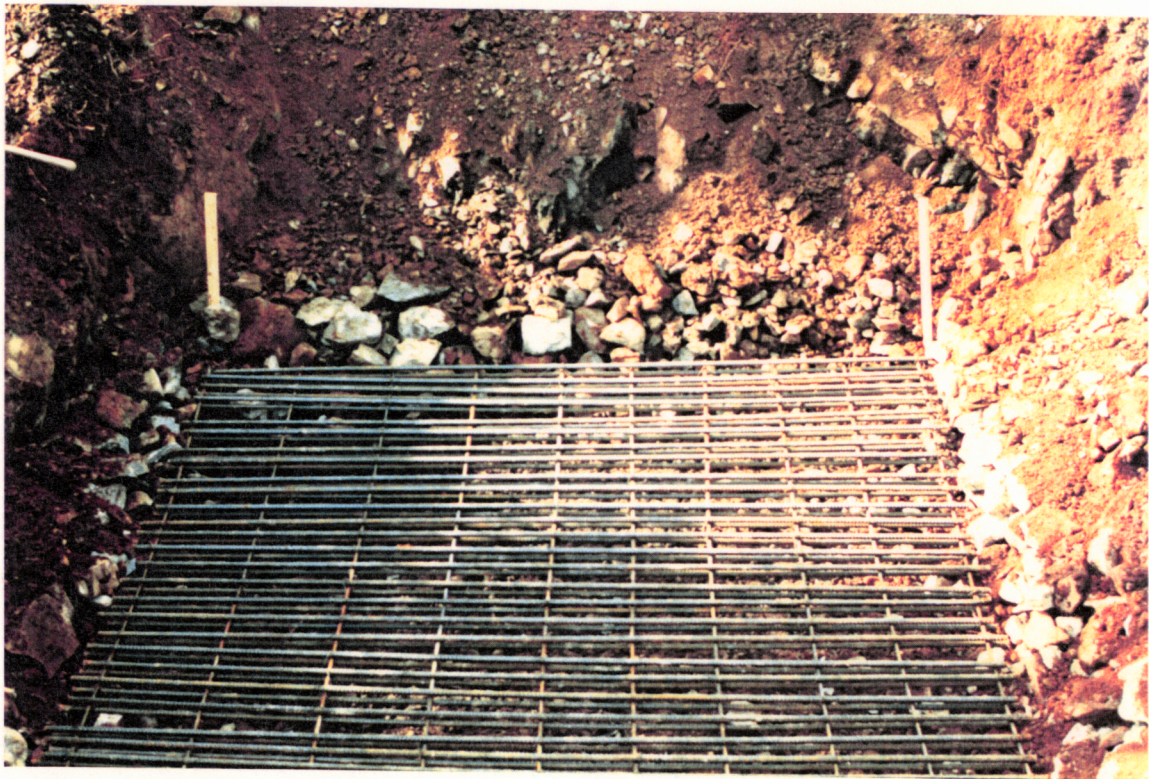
Rebar reinforcement mat in position prior to delivery of concrete.
